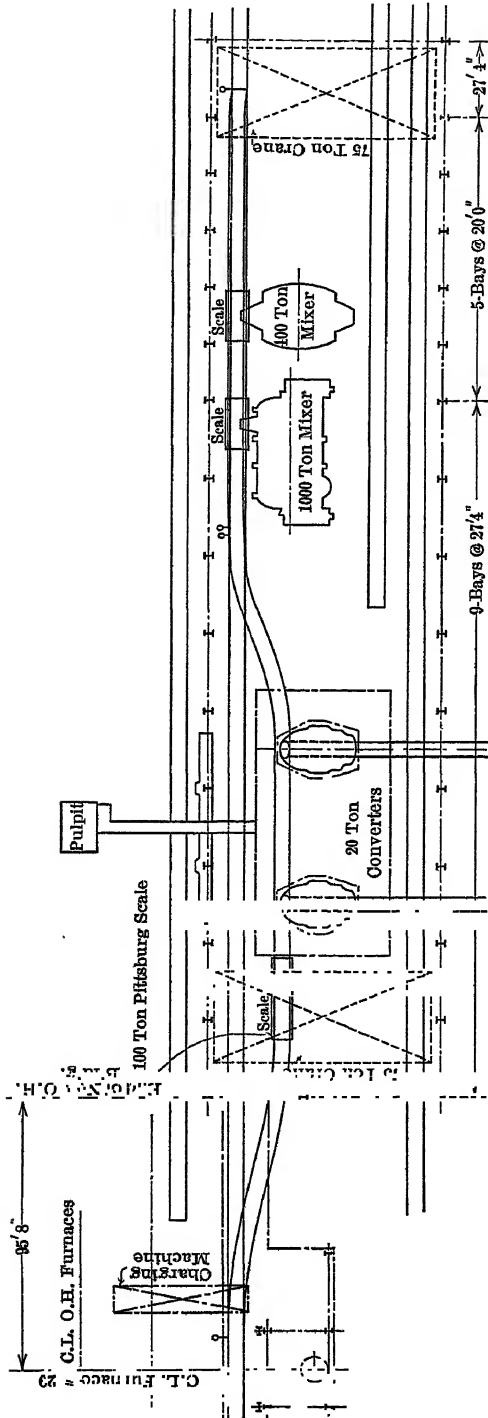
PLAN OF CONVERTER AND MIXER DEPARTMENTS, BETHLEHEM STEEL CO.
